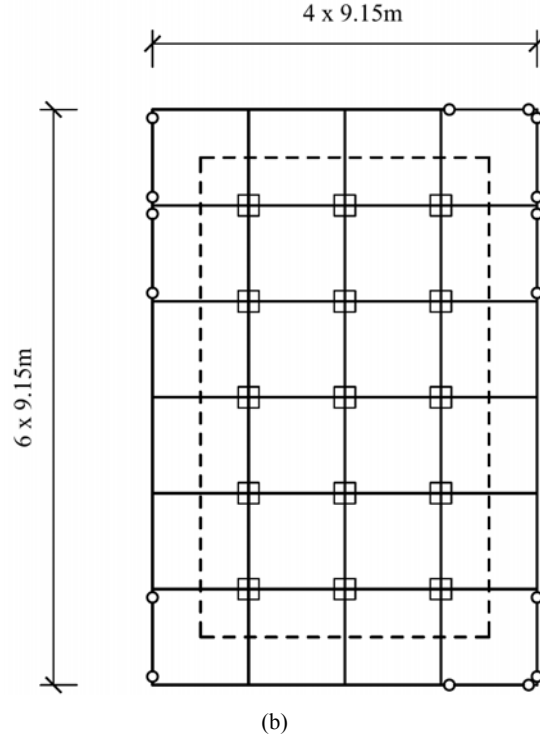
Schematics of the three-storey building, (a) elevation (b) plan (continued)
